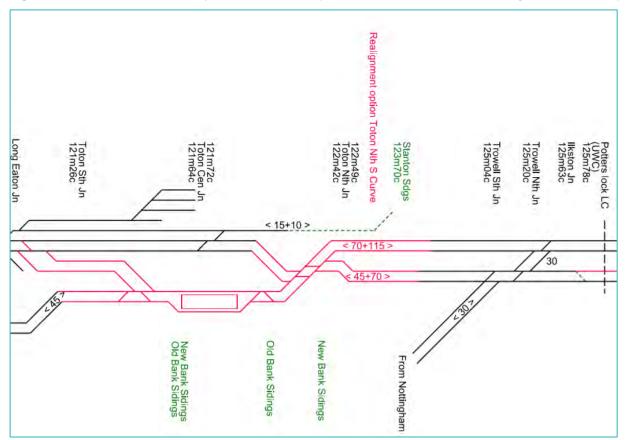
Toton Variant 1. Simplified Schematic (revised Trent Junctions area layout not shown)
